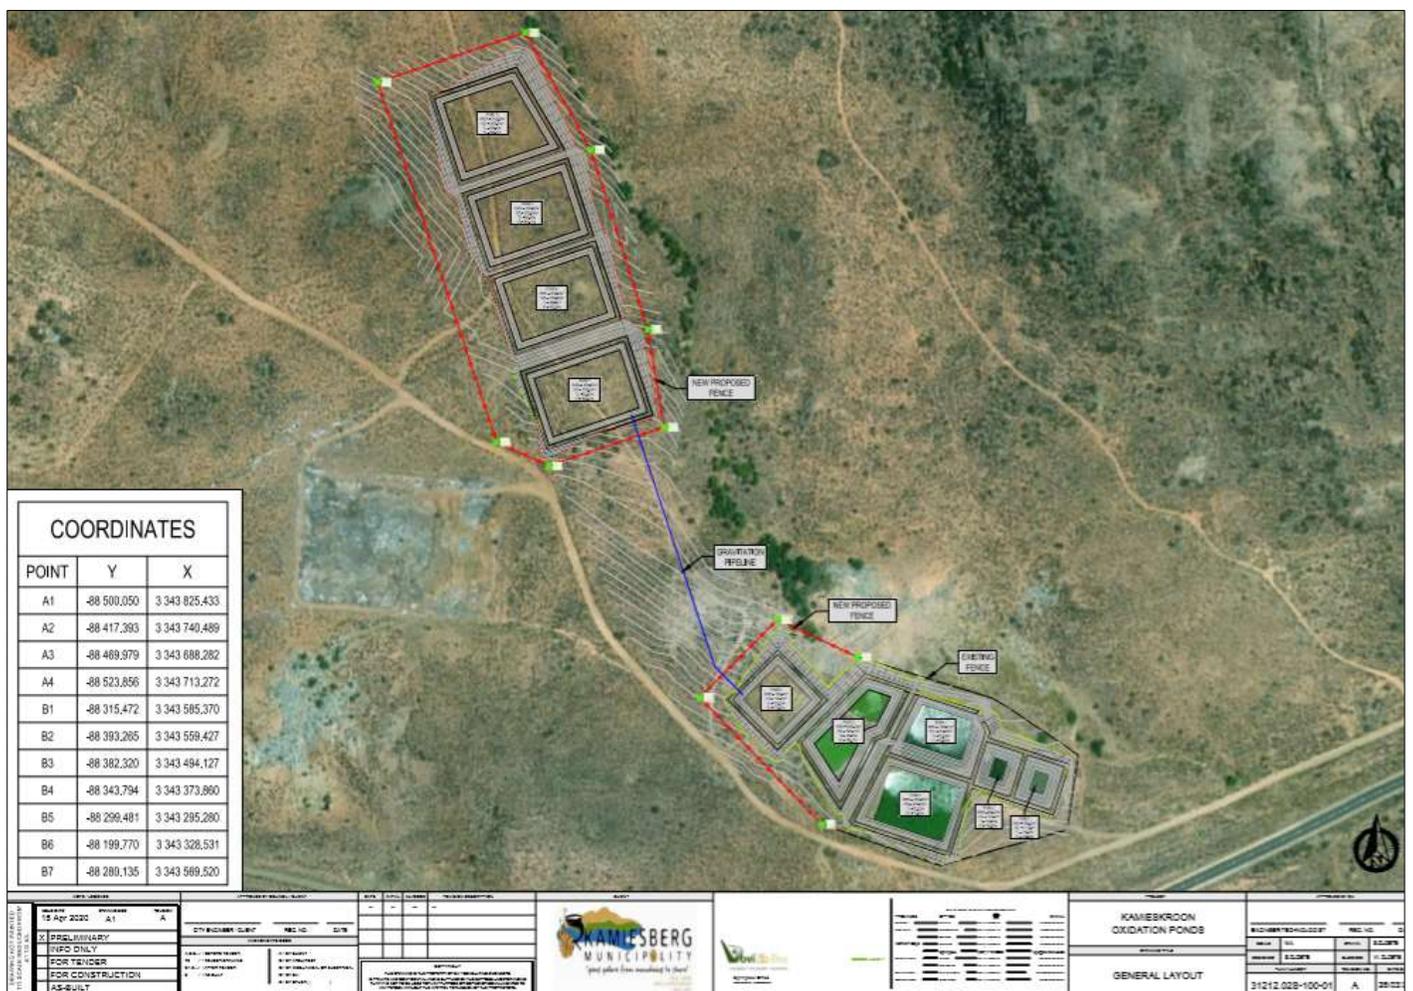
Proposed upgrade of the Kammieskroon Oxidation Ponds: Site Development Plan.
